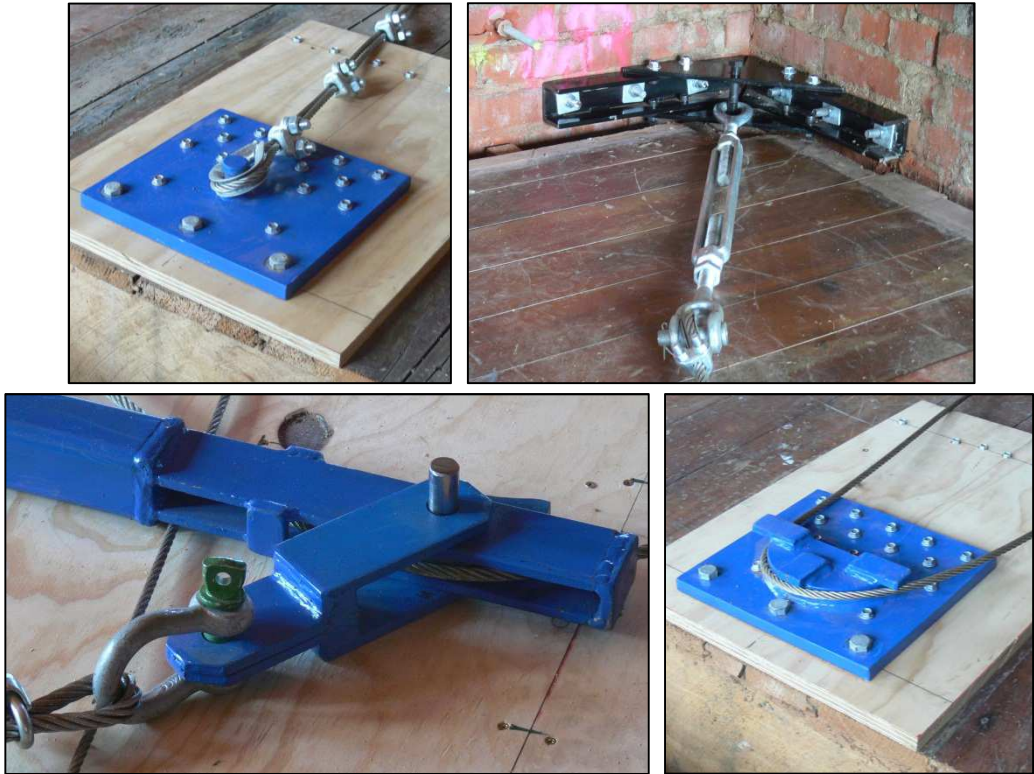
Details: a) external loading plate; b) wall connection; c) frame pulley d) central loading plate;
